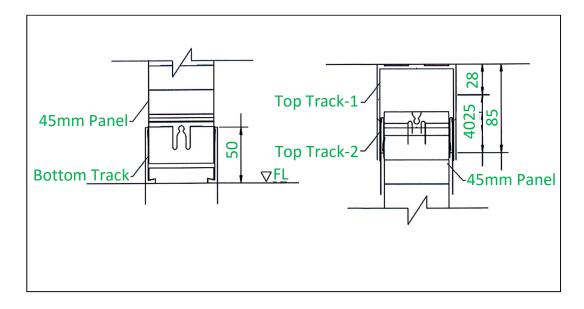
SFS3000 System Panel Top and Bottom Track Joint
